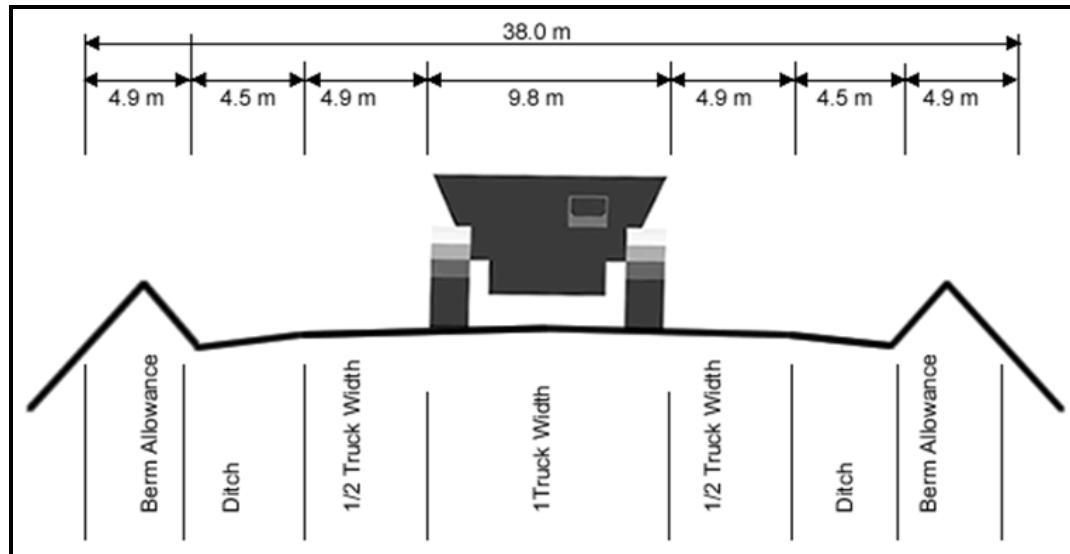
Single Lane High Wall Haul Road Cross Section
